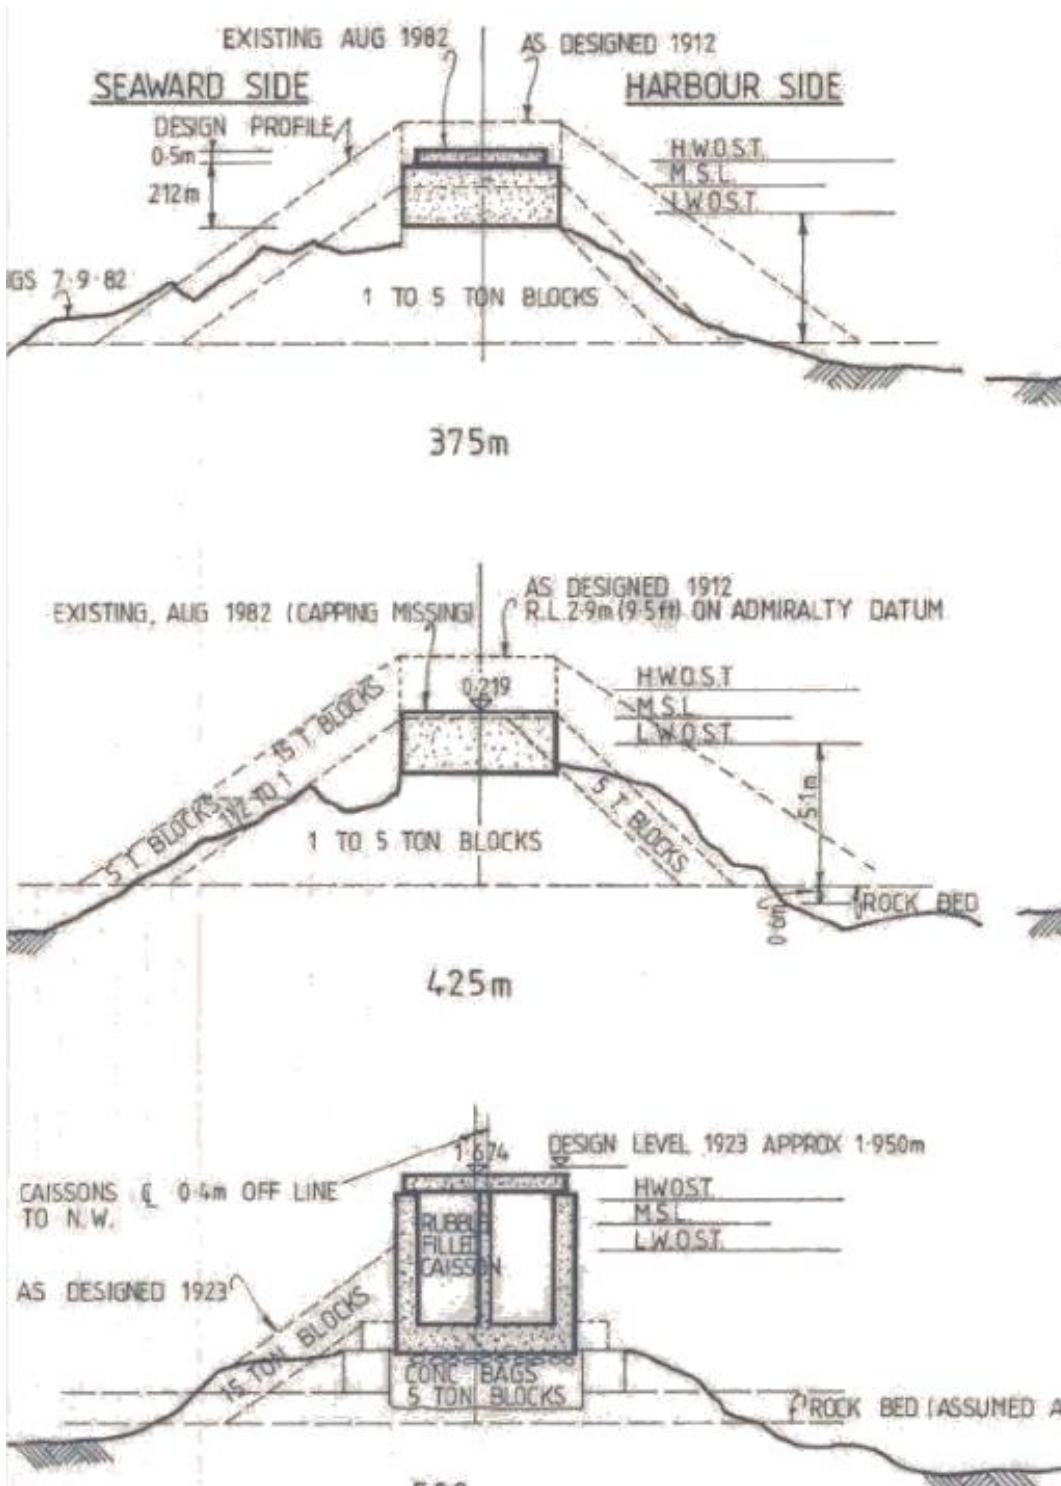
Plan of Existing Outer Breakwater Typical Cross Sections
